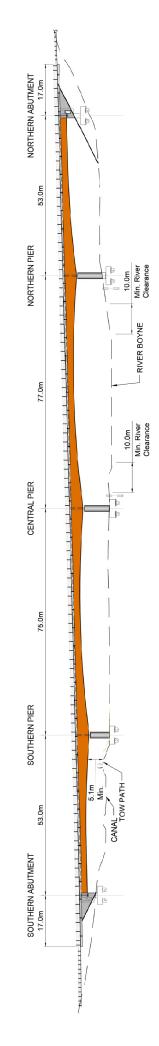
Proposed Span Arrangement of the River Boyne Bridge
